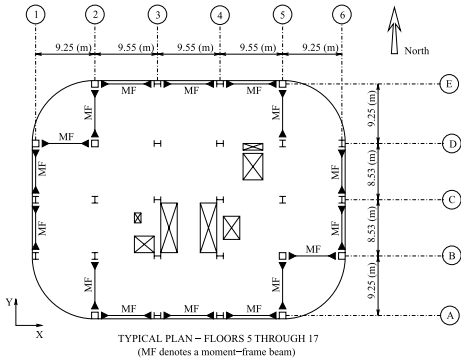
Typical plan for Building 2. Lines marked with 'MF' indicate moment-frame bays.
